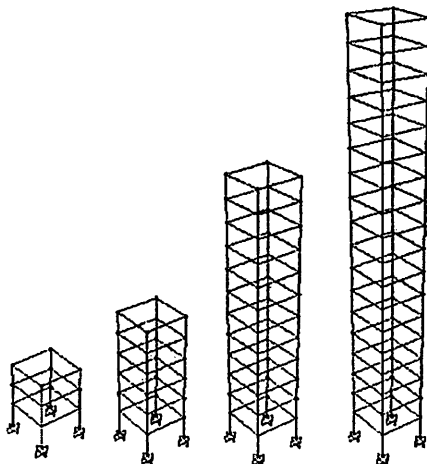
Three-dimensional generic frame models representing 3-, 6-, 12-, and 18-story single-bay reinforced concrete frames.
